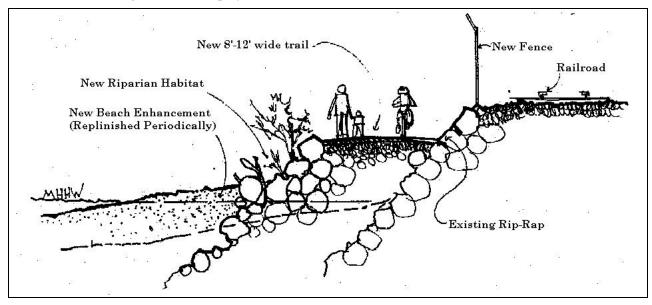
Cross-section of Proposed Beach Walk Terrace
